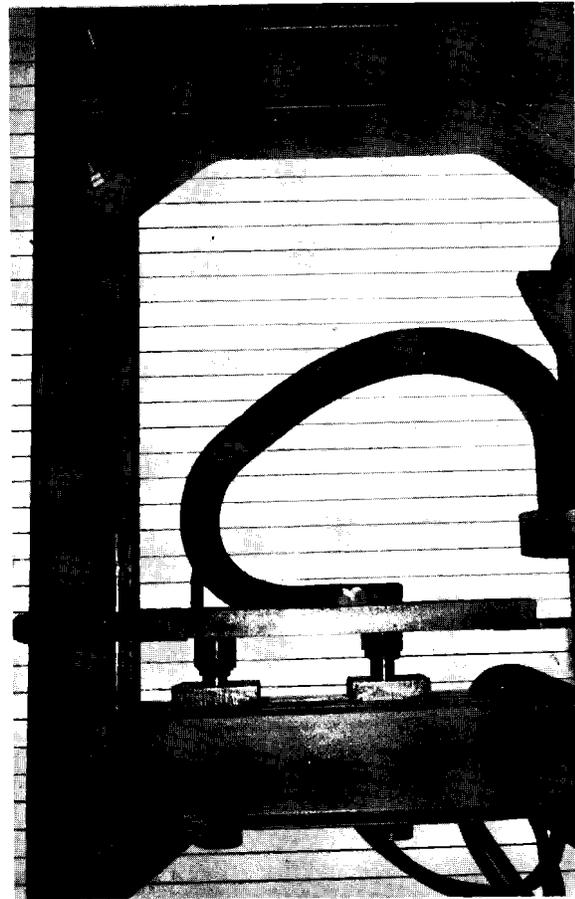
Hot-bent attenuator mounted for Test B.  $\Delta = 0$  in.
